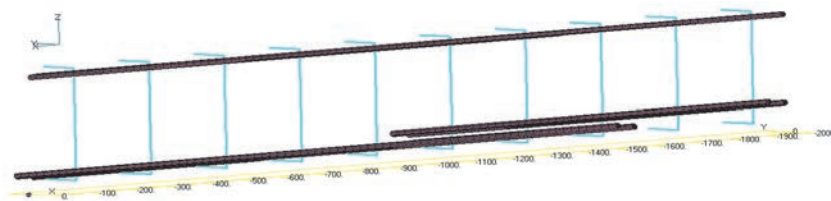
Longitudinal and transverse reinforcement of reinforced concrete beam
